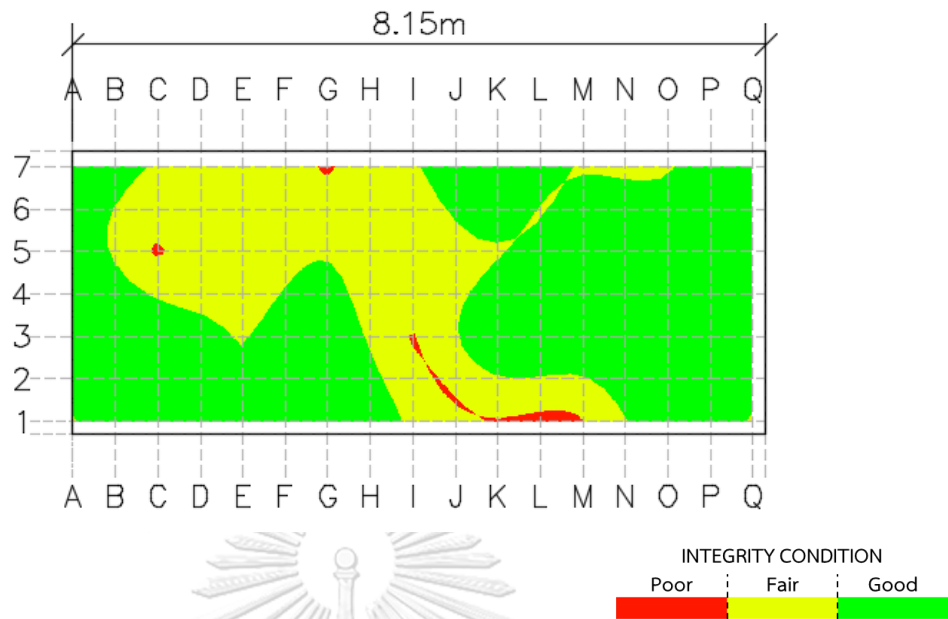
Integrity of concrete based on impact echo test on span no. 1
